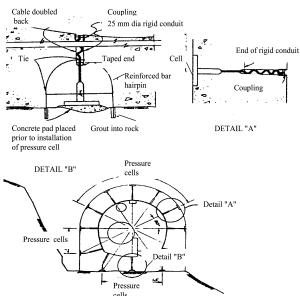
Pressure cells installation against the conduit foundation and outside conduit surface facing the embankment fill [16]
